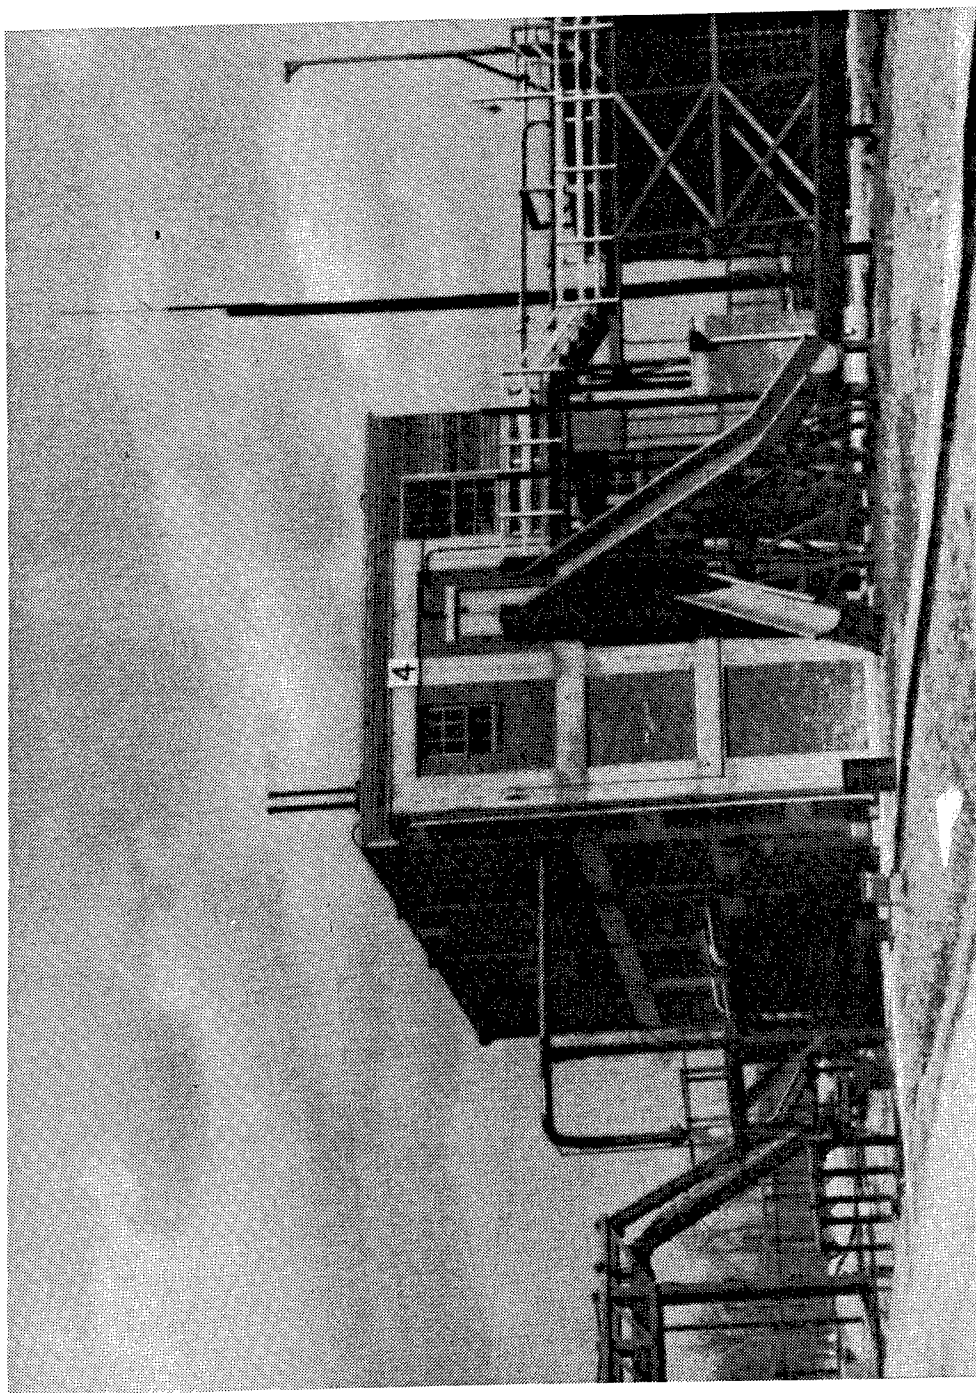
Washing, E Building, Area B (courtesy of Holston AAP Photo Set No. 21-B [on file Engineering Vault, Building 26]).
